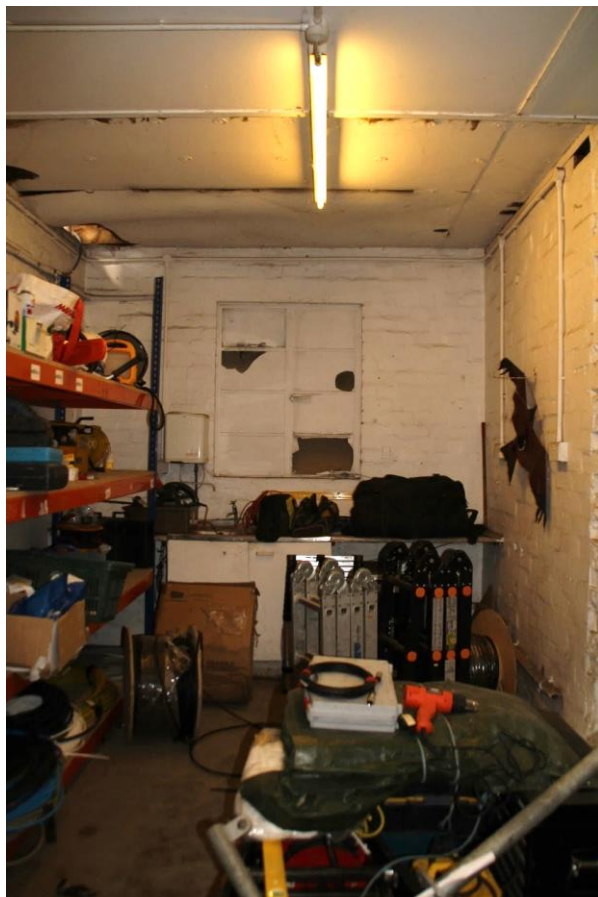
Internal view of the western section of store block 2, looking east towards the central wall
